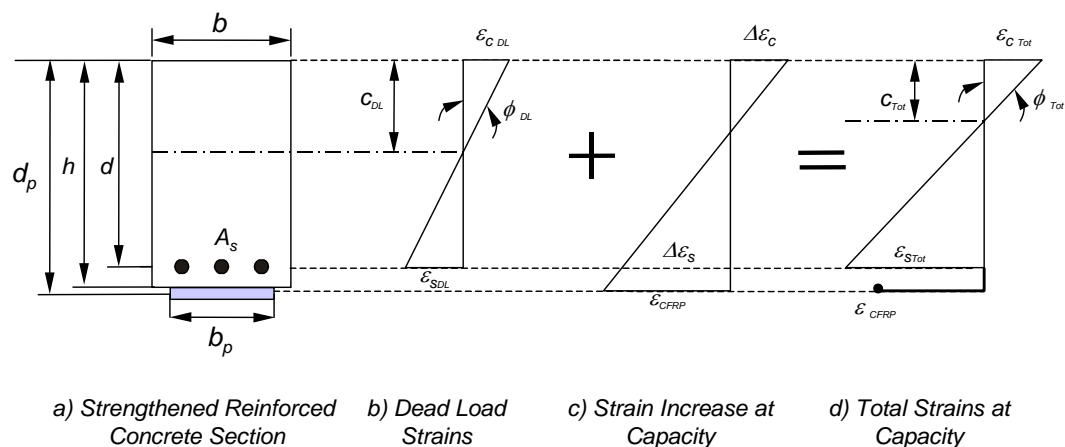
Increment of Strains on Strengthened Reinforced Concrete Section
